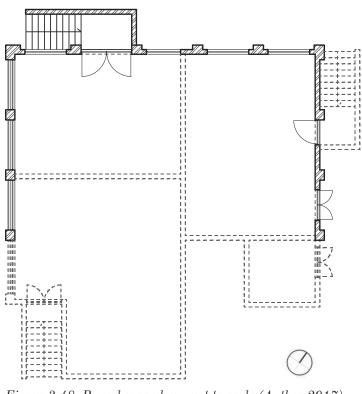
Powerhouse plan - not to scale (Author 2017)
